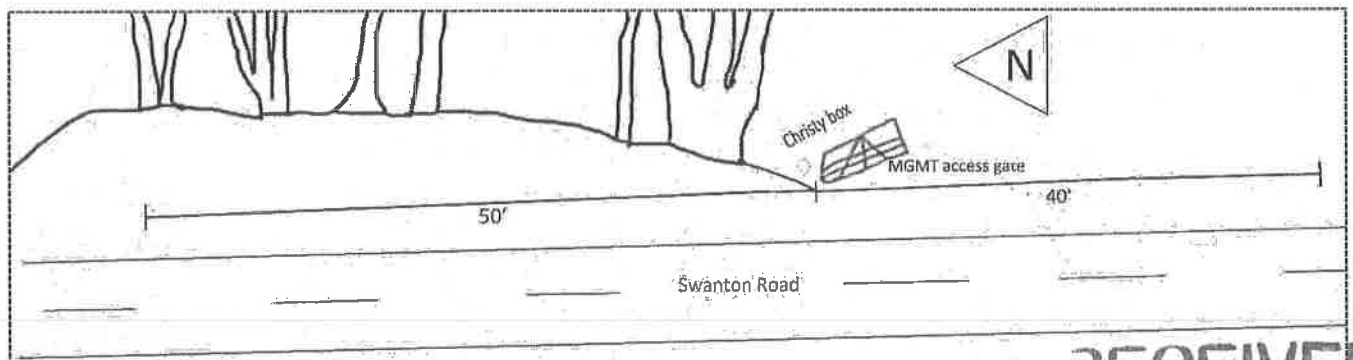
Mitigation Point E (MPE) Sketch of Existing Condition
